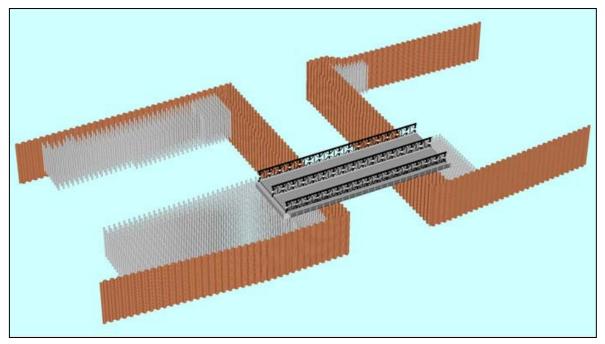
Model view of modular bridge, sheet piling, and CMCs
